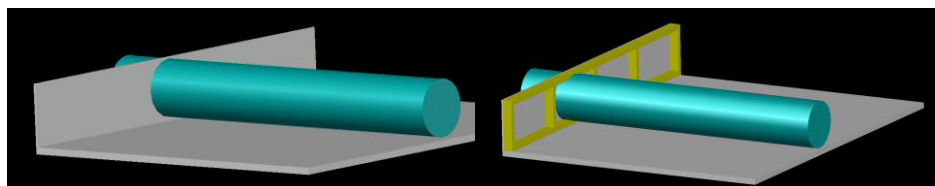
Duct penetrating the vertical wall of a suspended ceiling. 4a shows as-designed solution. 4b shows the supporting structures needed for installing the ceiling. In 4b the duct does not fit between the horizontal structures.
